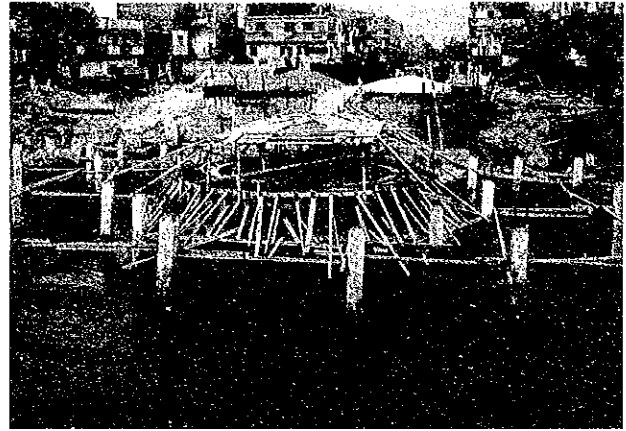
Rotary bridge under construction (the rotating table is being constructed)
